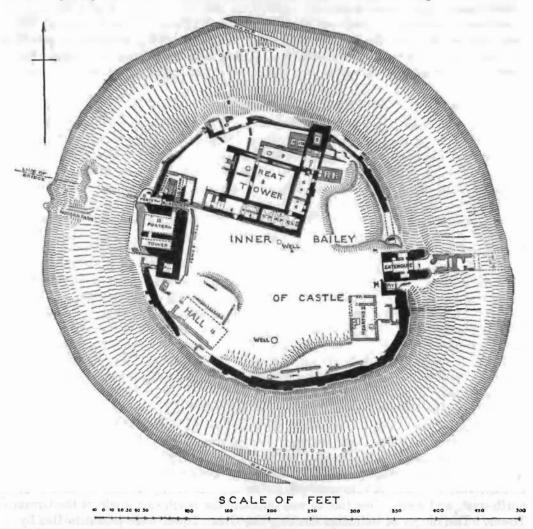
OLD SARUM CASTLE: DETAILED PLAN, AFTER THE EXCAVATION OF 1909-15
